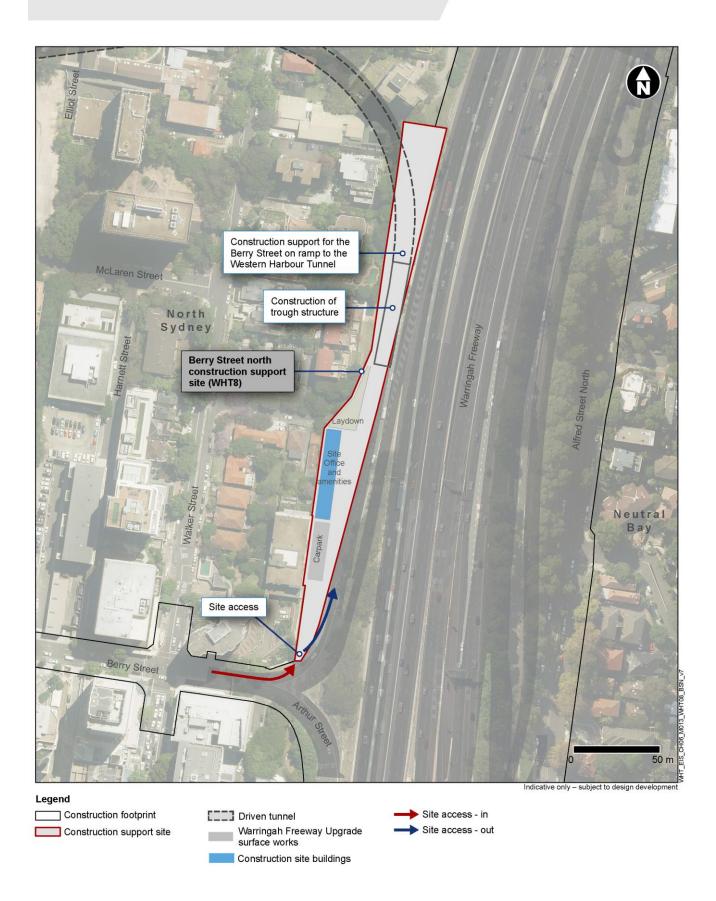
Indicative construction support site layout – WHT8 – Berry Street north
